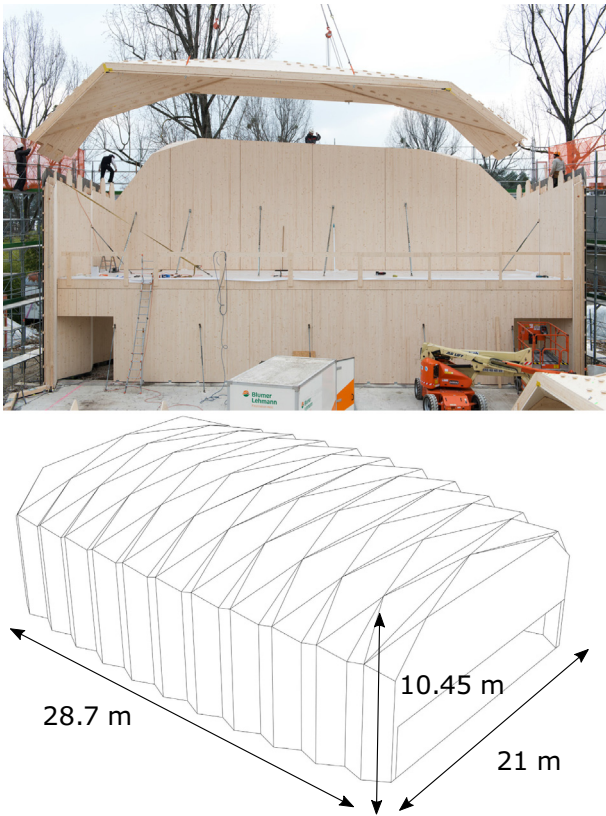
Photo of ongoing Vidy theatre building site [Photo: Ilka Kramer Photography] and building size.
